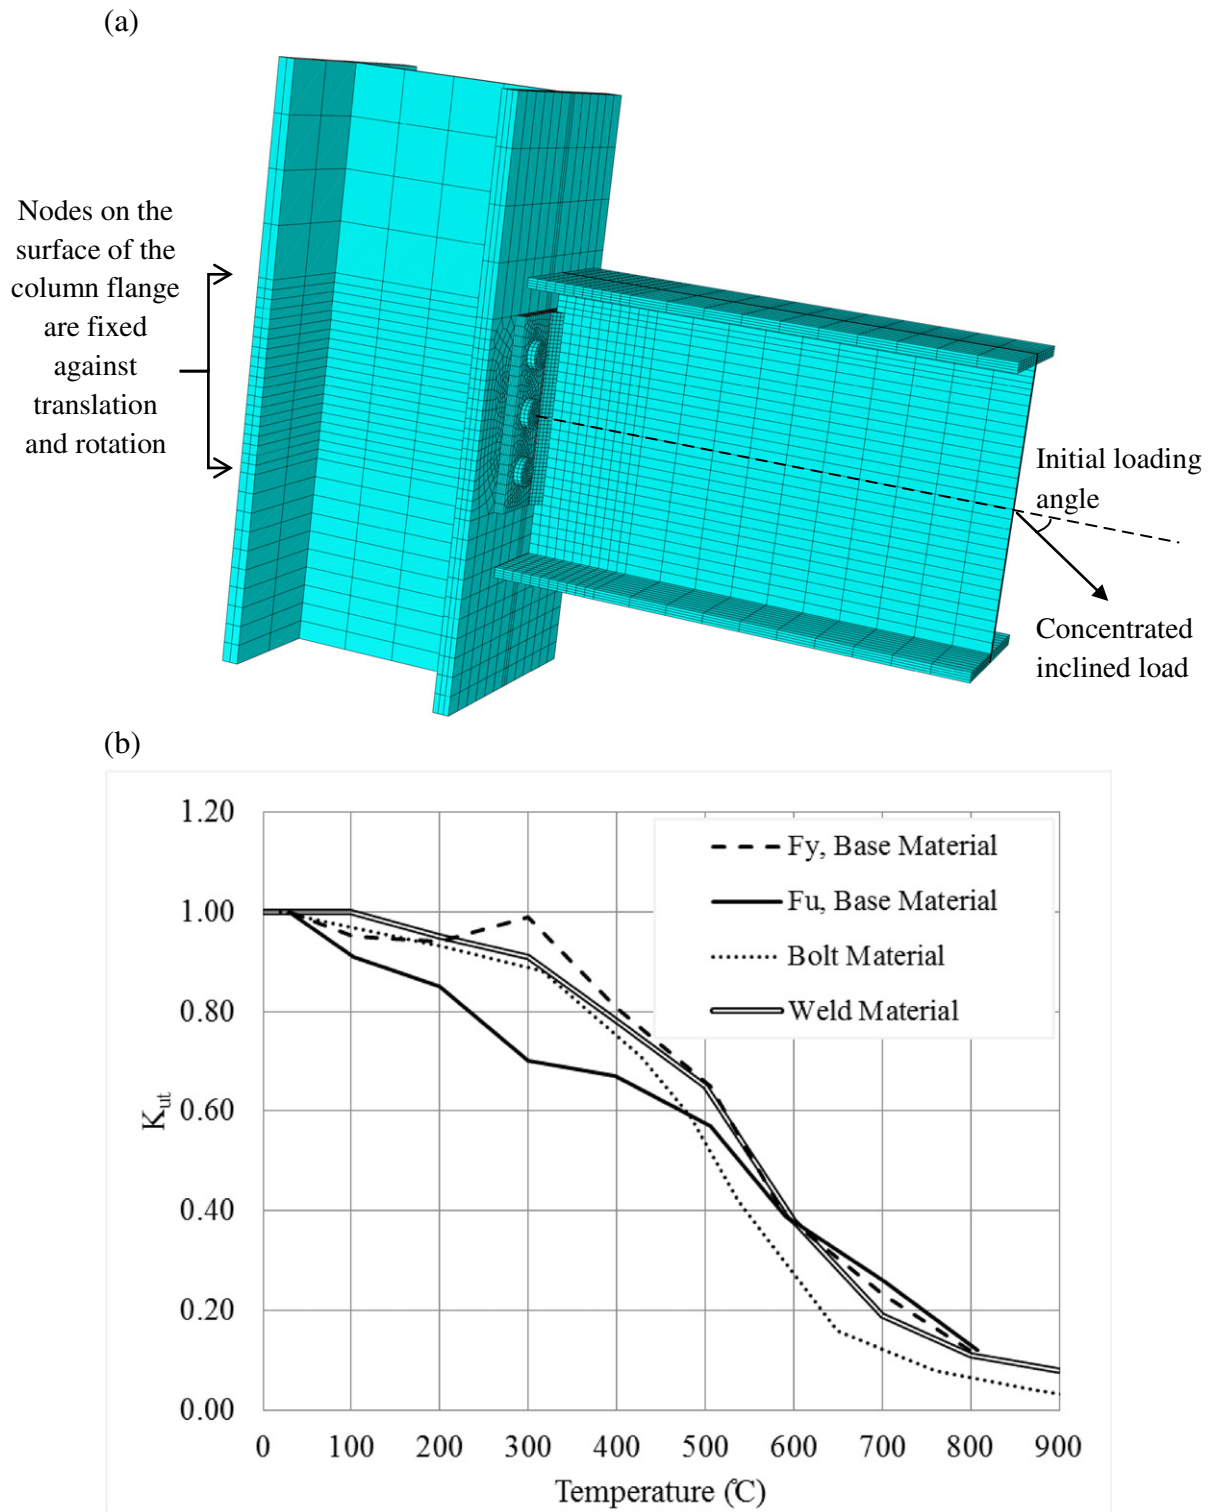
(a) Connection details in FE model, (b) Strength retention factors for structural steel, structural bolts, and weld material at elevated temperatures.
